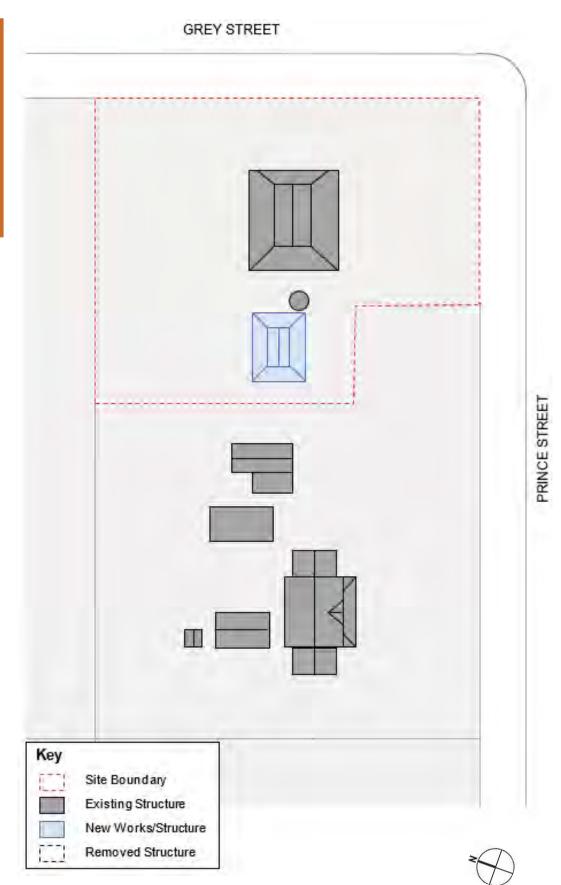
Clarence Town Courthouse and site period of construction - 1992
